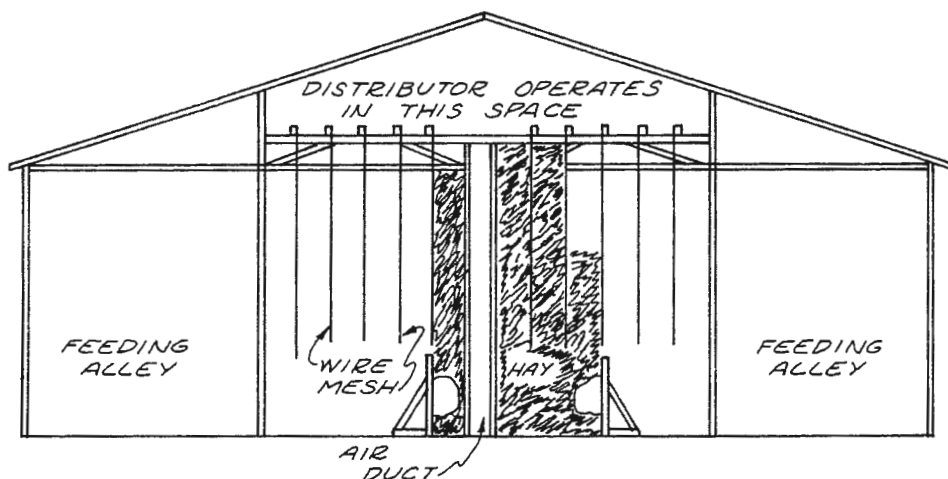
Sectional view of chopped hay storage area and feeding alleys
